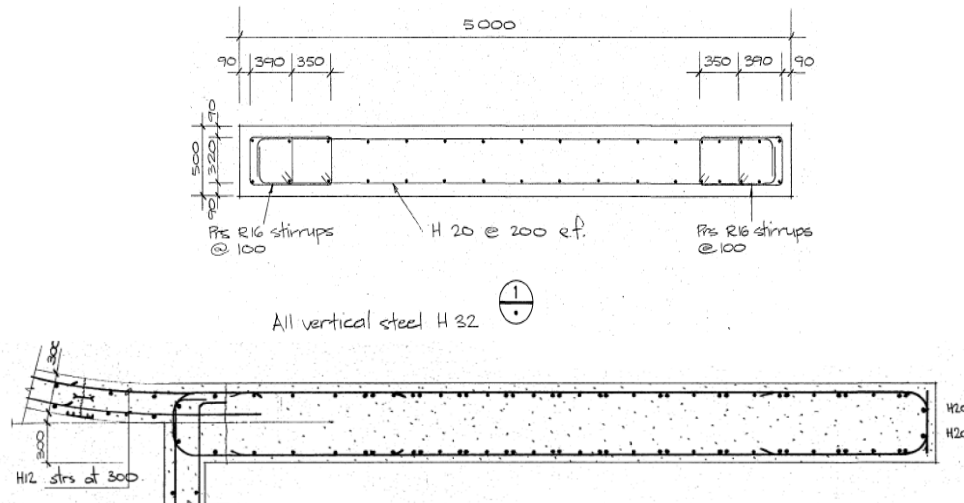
Wall detailing of the Crown Plaza building (1980-1989)
